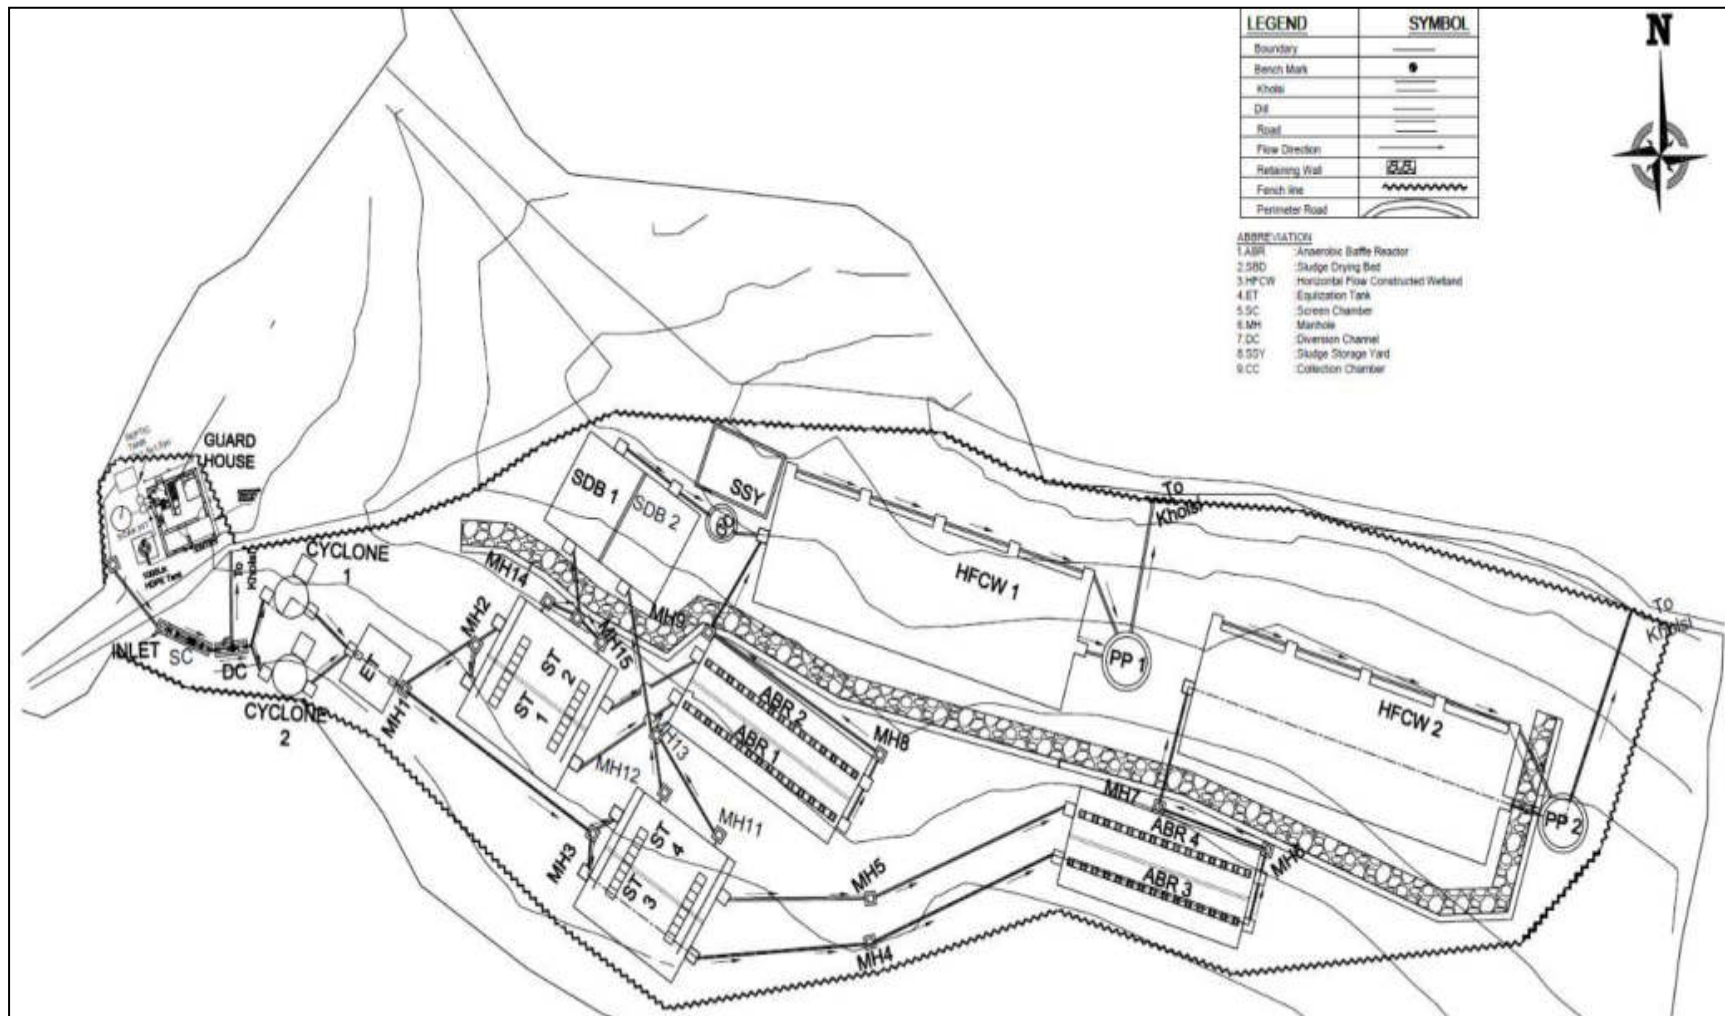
Layout plan of the Proposed WWTP-3 (3.5 Ips)
